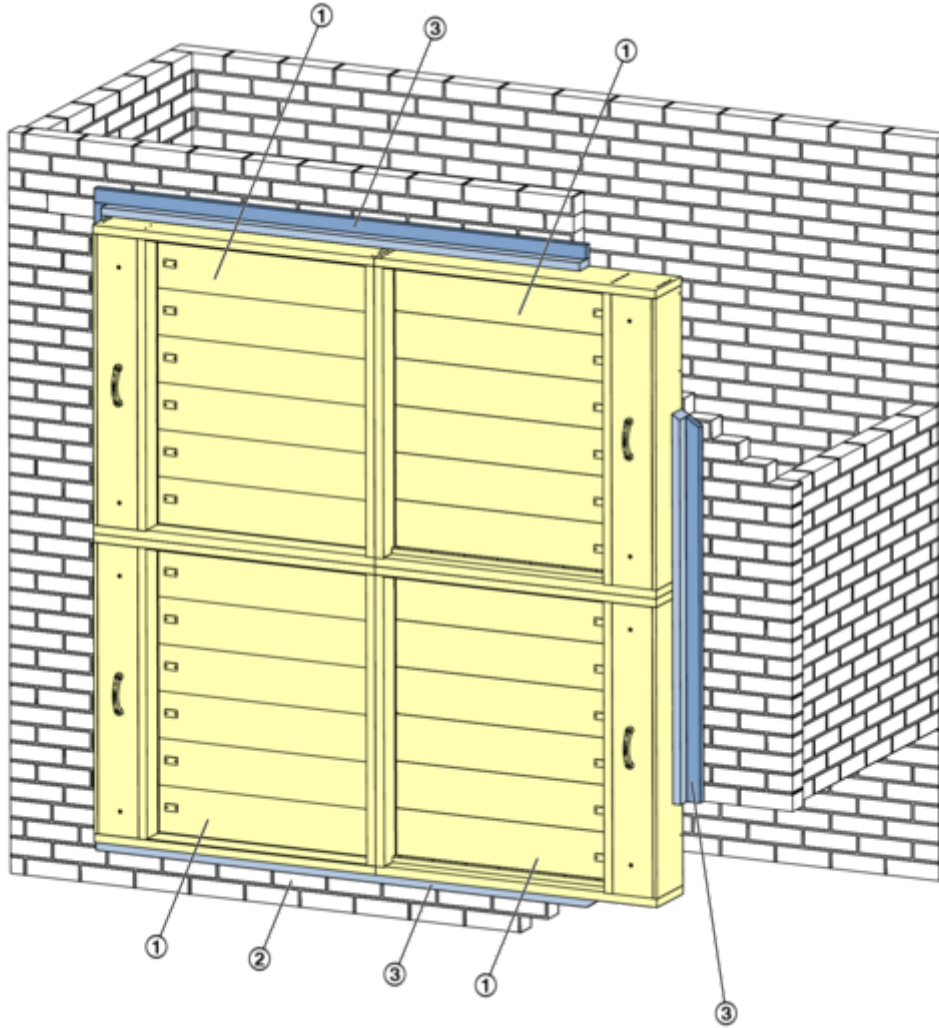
Dry mortarless installation on solid wall or solid shaft wall EI 120 S v_{edw} - Multiple occupancy of the installation opening
